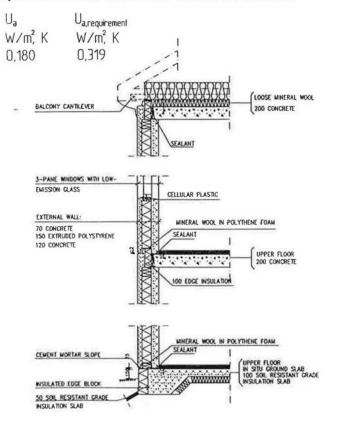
Section of the building construction for the awarded HSB/Ohlsson & Skarne entry. Note the balcony cantilever, which eliminates thermal bridging at balcony floor connections.
